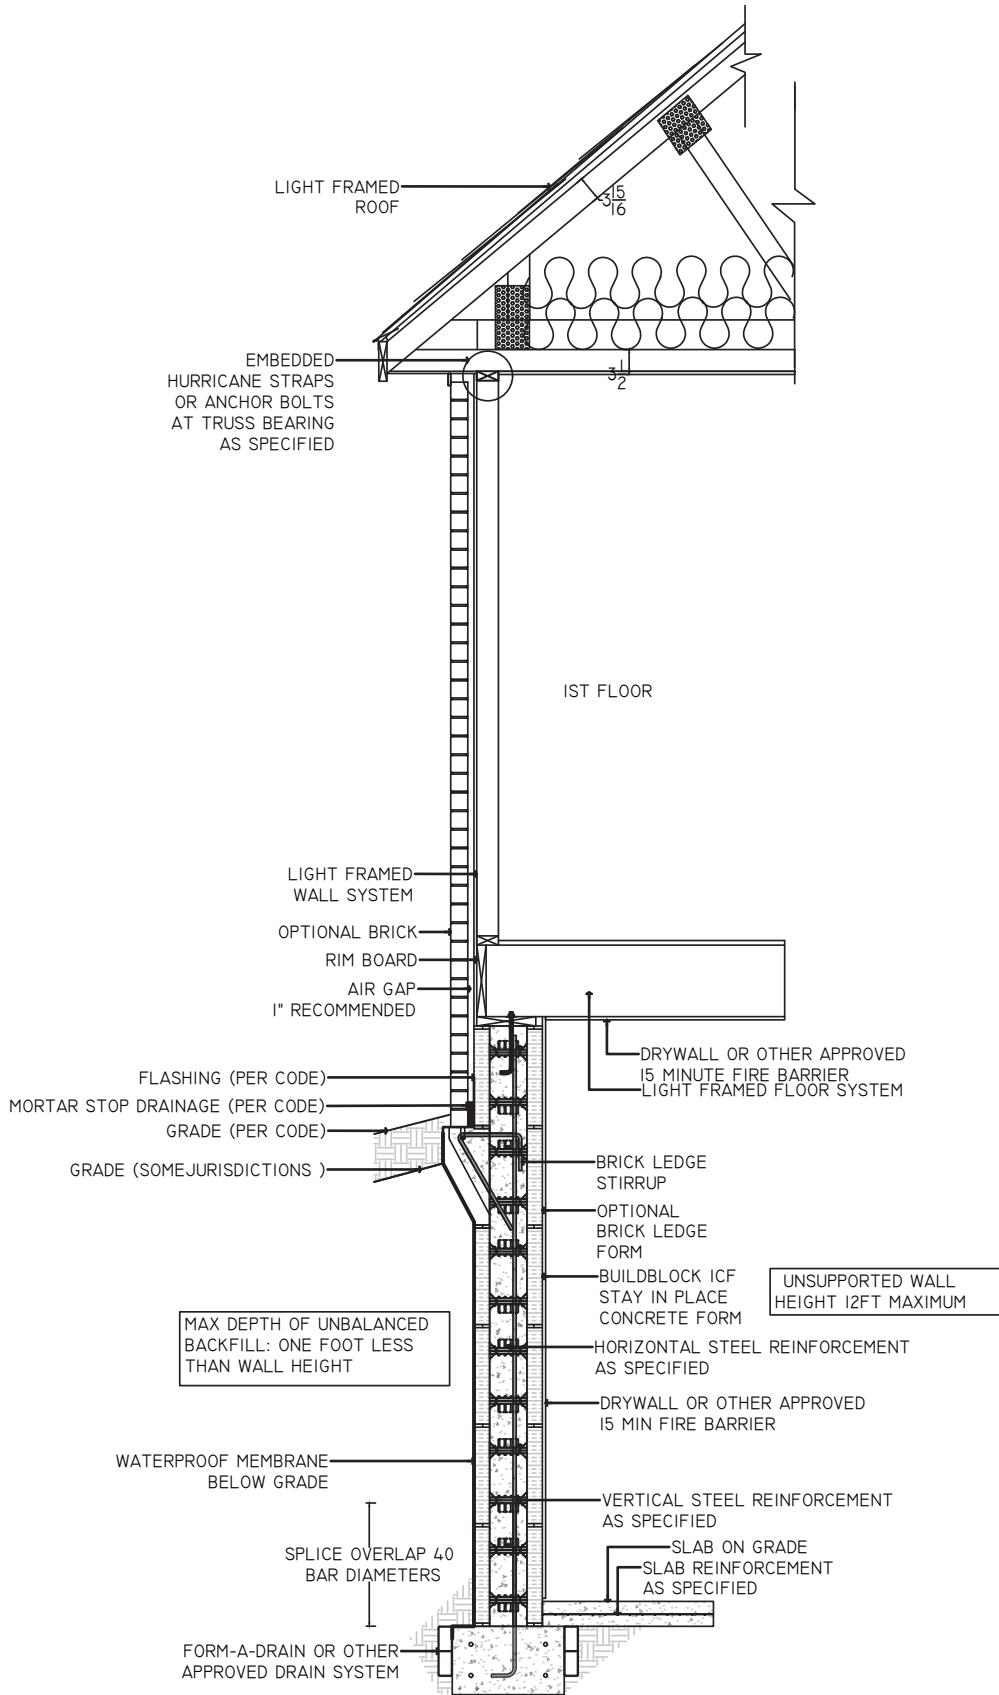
LOAD CASE 1. SECTION CUT THROUGH FLAT WALL OR VERTICAL CORE OF SCREEN GRID WALL. SUPPORTING LIGHT FRAMED WALL.
